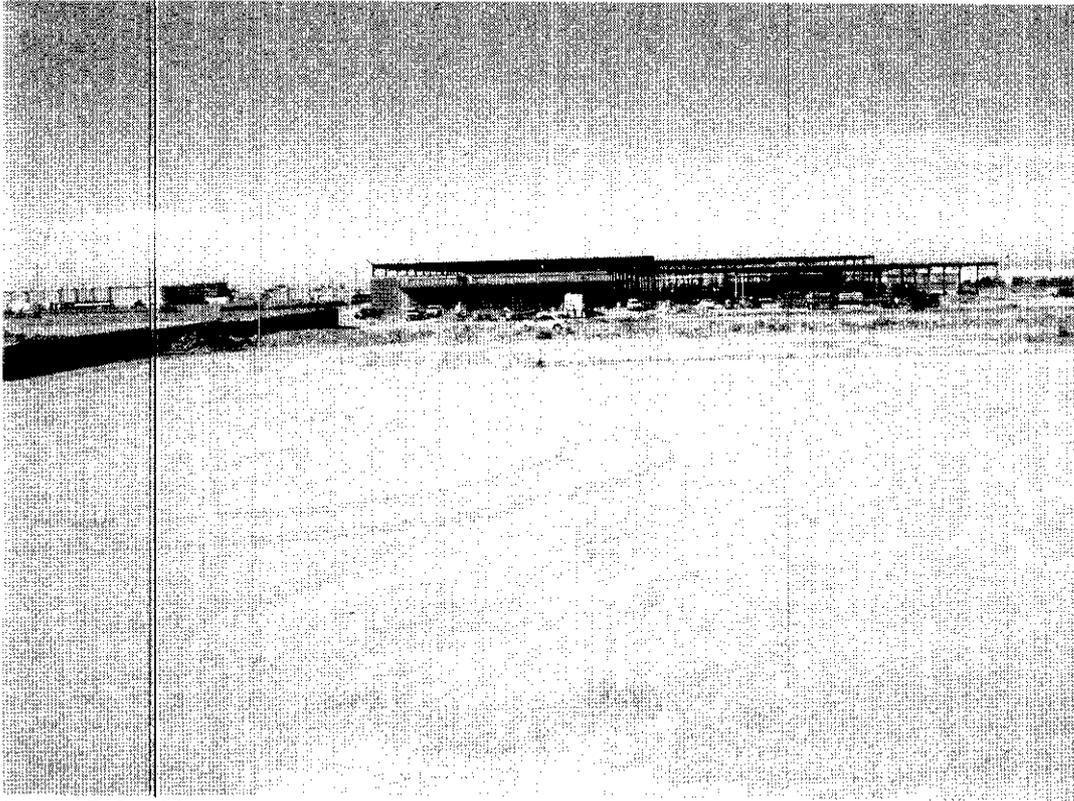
Looking northwest from Tracts B-2 & B-3
